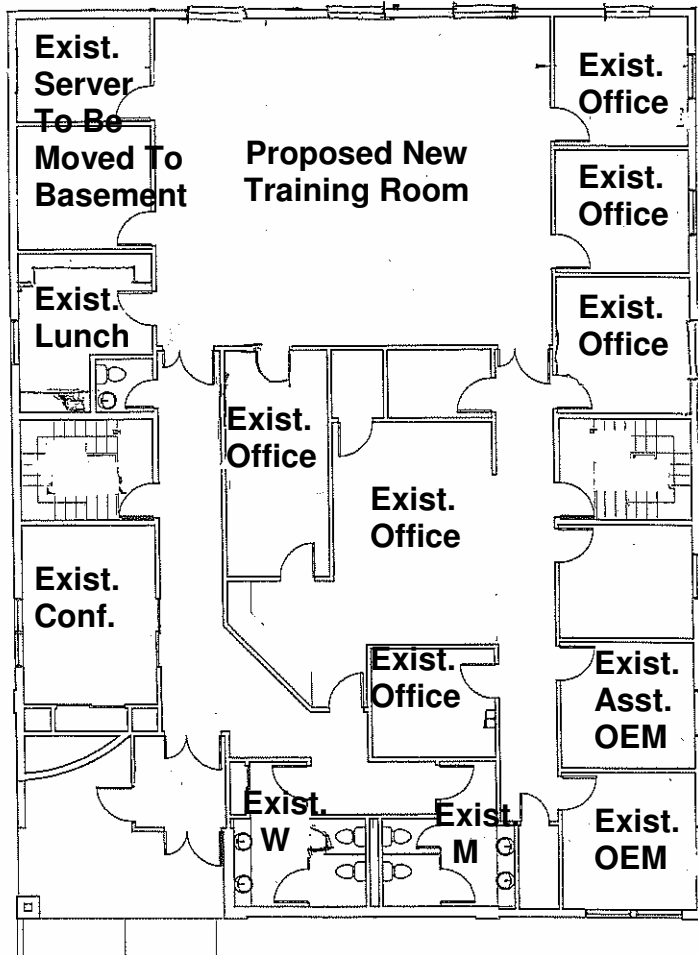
Scenario 3 - Proposed 1st Floor Layout
